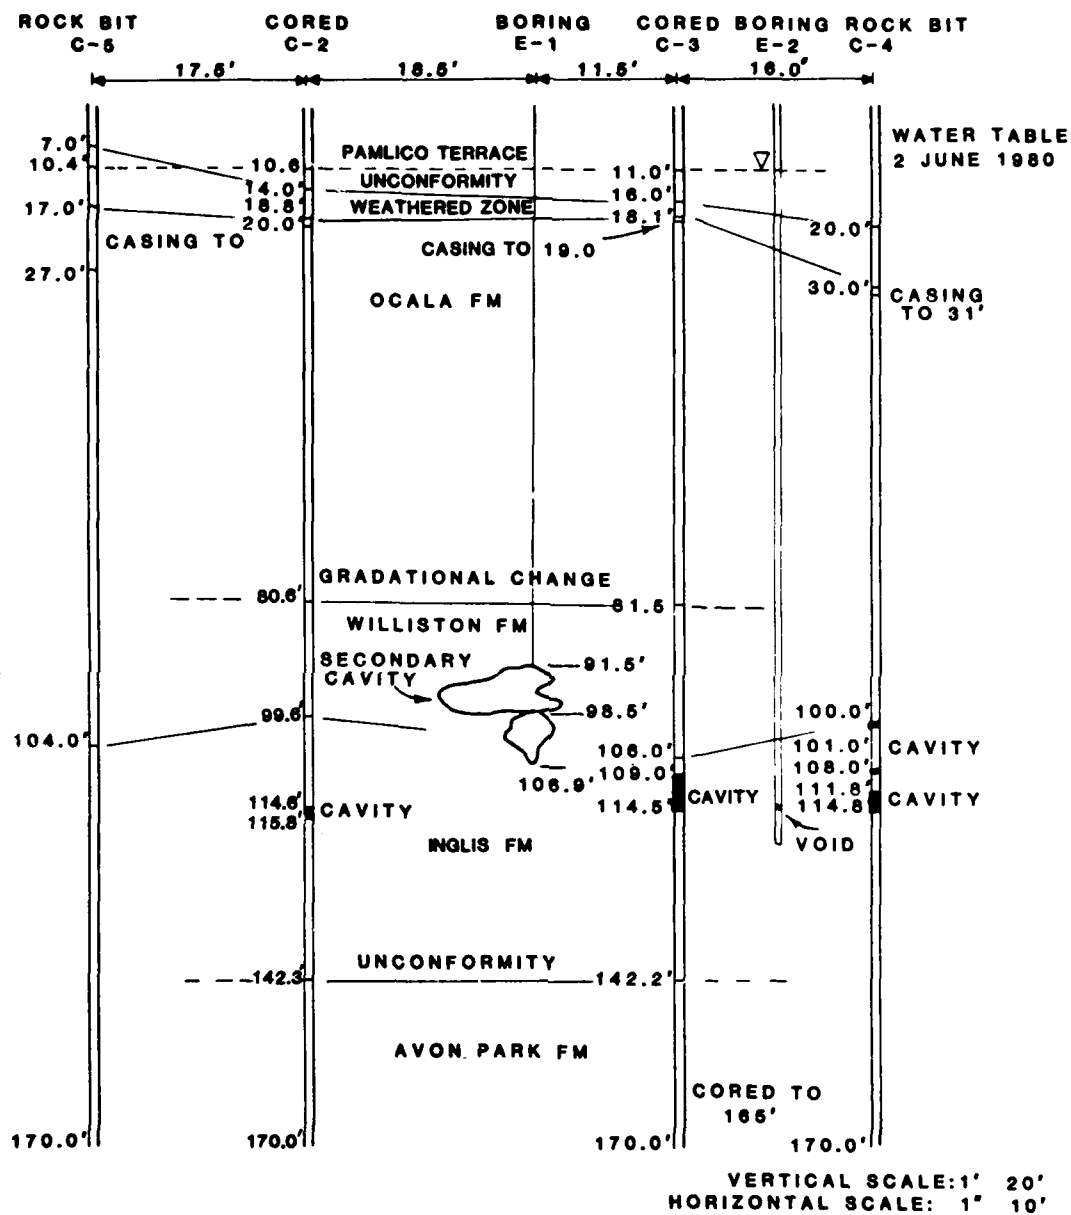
Cross section through borings C-2 to C-5 showing secondary cavity
